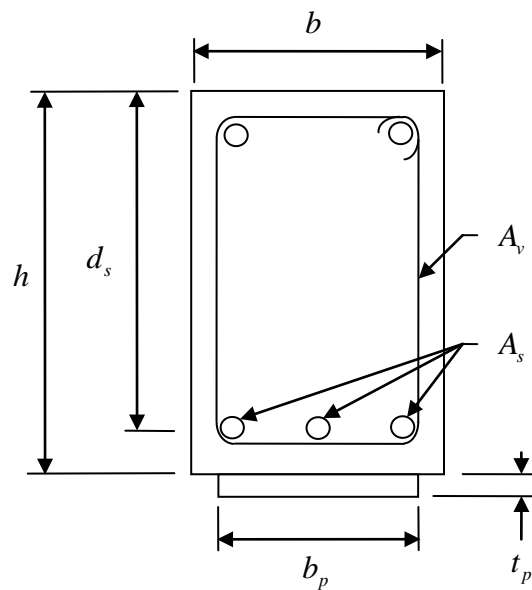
Typical Specimen Cross-Section used by Swamy et al. (1987)
